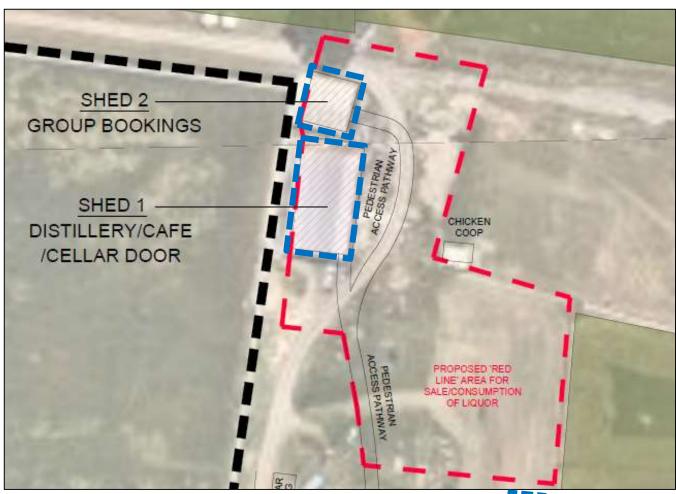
Existing Buildings (denoted with dashed blue outlines)
